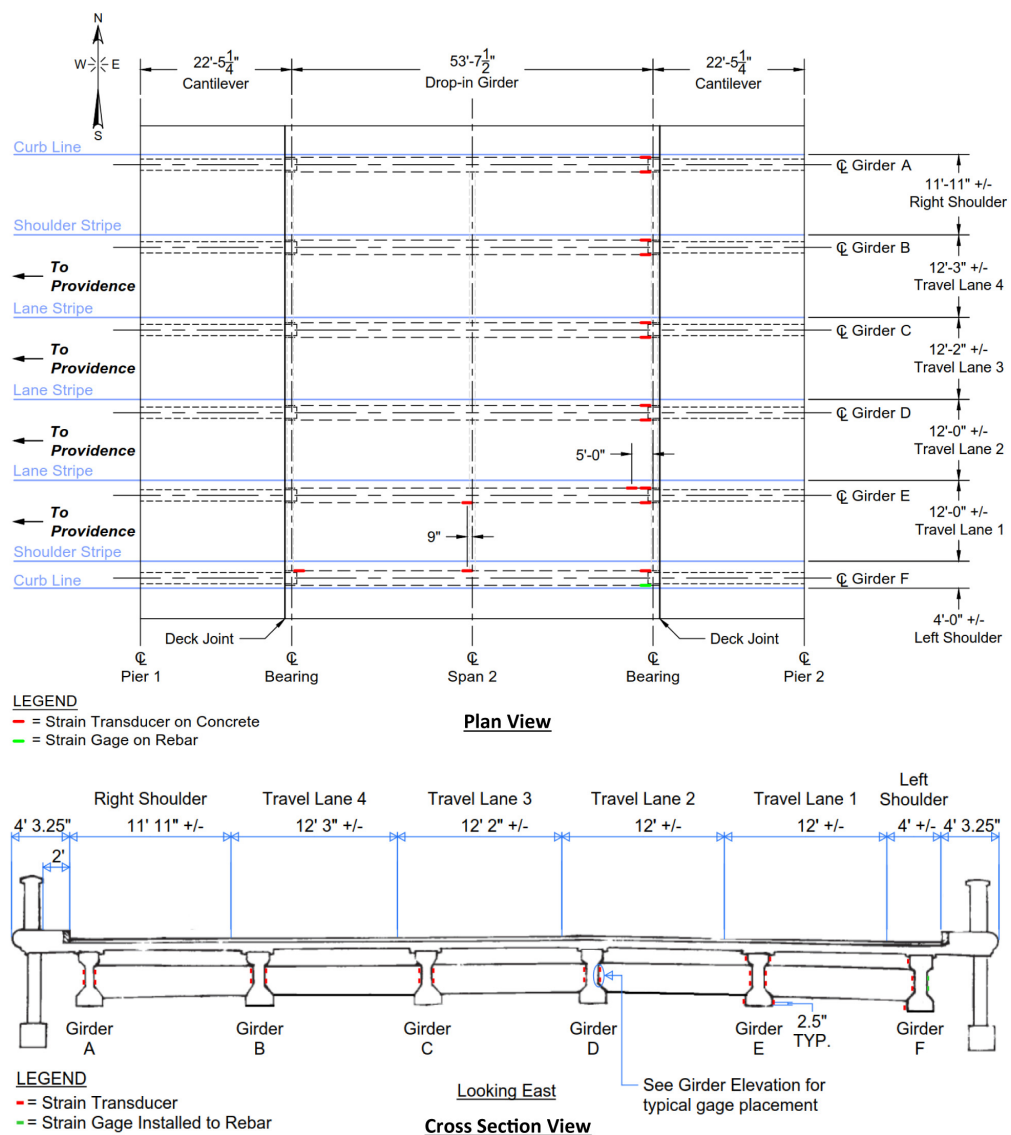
| Layout of 32 strain sensors on six drop-in girders.
